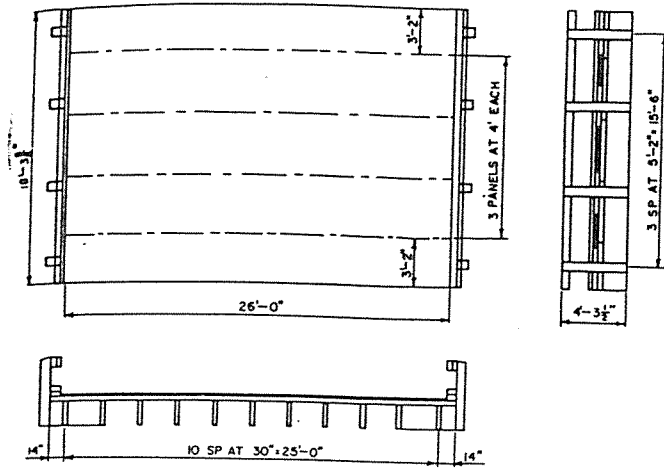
Construction schematic of Press-Lam bridge over Stony Creek, Va. (M 145 646)
